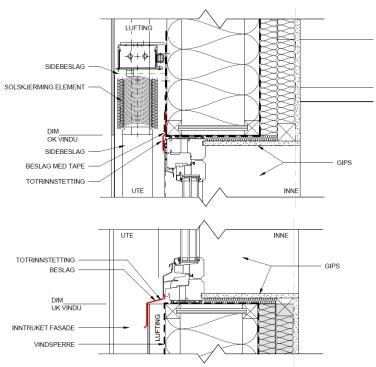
Details of the windows on the south wall, with sun shading. Illustration: ABO Plan og Arkitektur.
